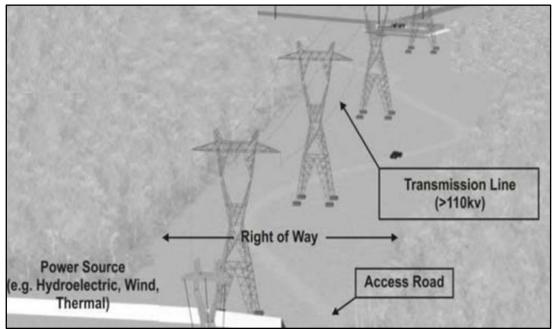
Right of Way and Access Road for OHTL (IFC, 2007)
